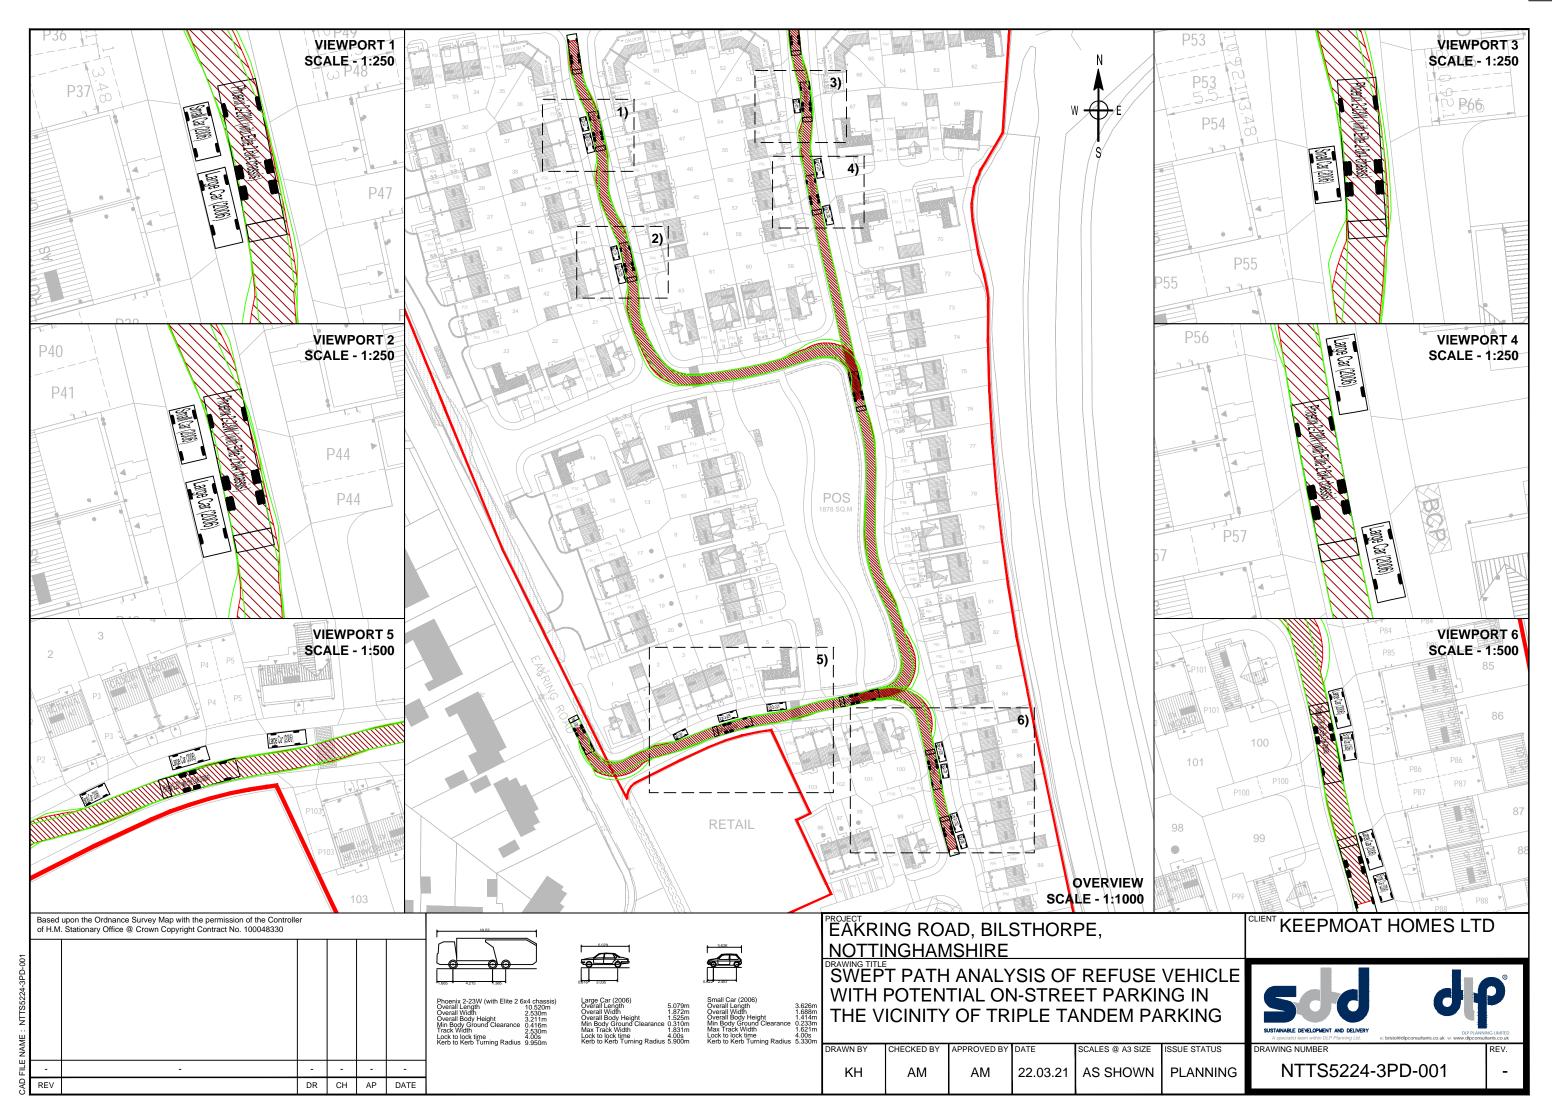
On street parking occurring on carriageway width of 5.5 metres
